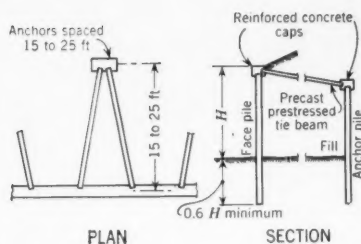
Typical concrete sheetpile retaining wall consists of a face wall of prestressed concrete sheetpiles capped with reinforced concrete and tied back to an anchorage system with precast prestressed tie-beams.
